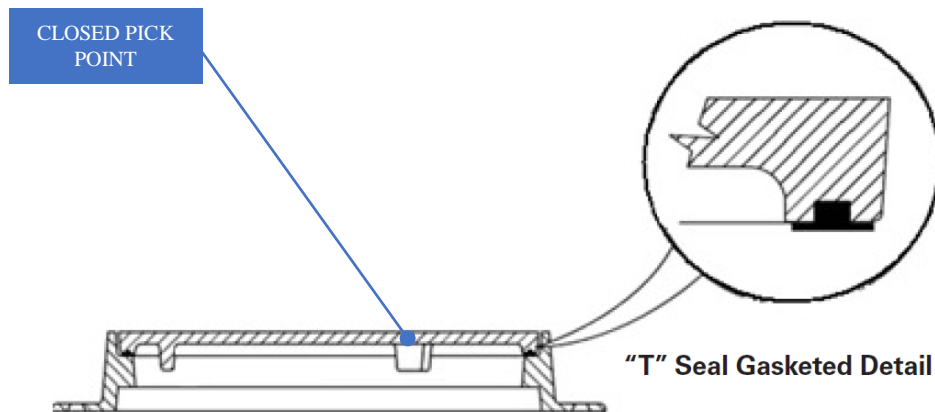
Manhole Access Frame and Cover with Gasket and Sealed Pick Point
